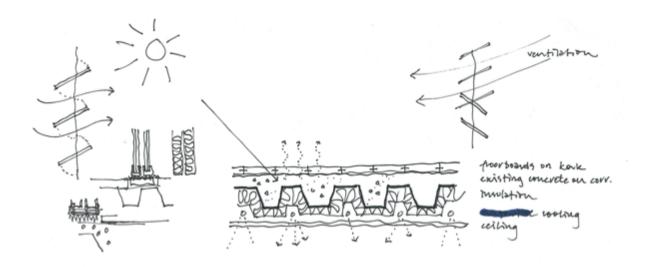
Details; thermal mass, insulation, blinds, heating and cooling pipes etc.
